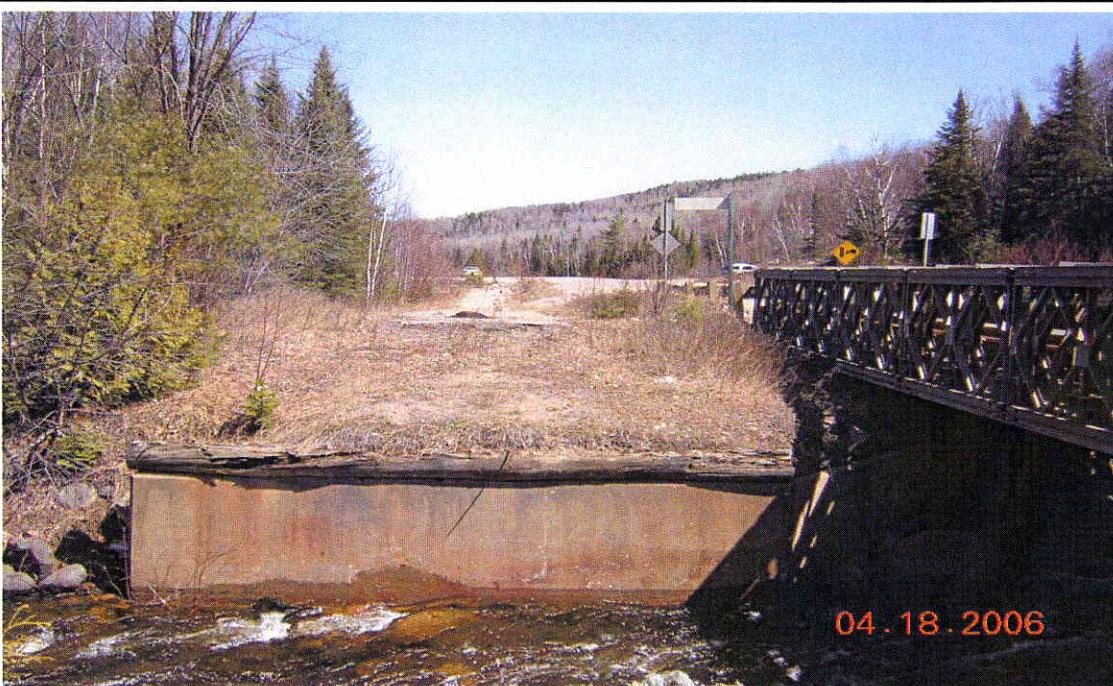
Old north abutment from earlier bridge west of existing bridge.
